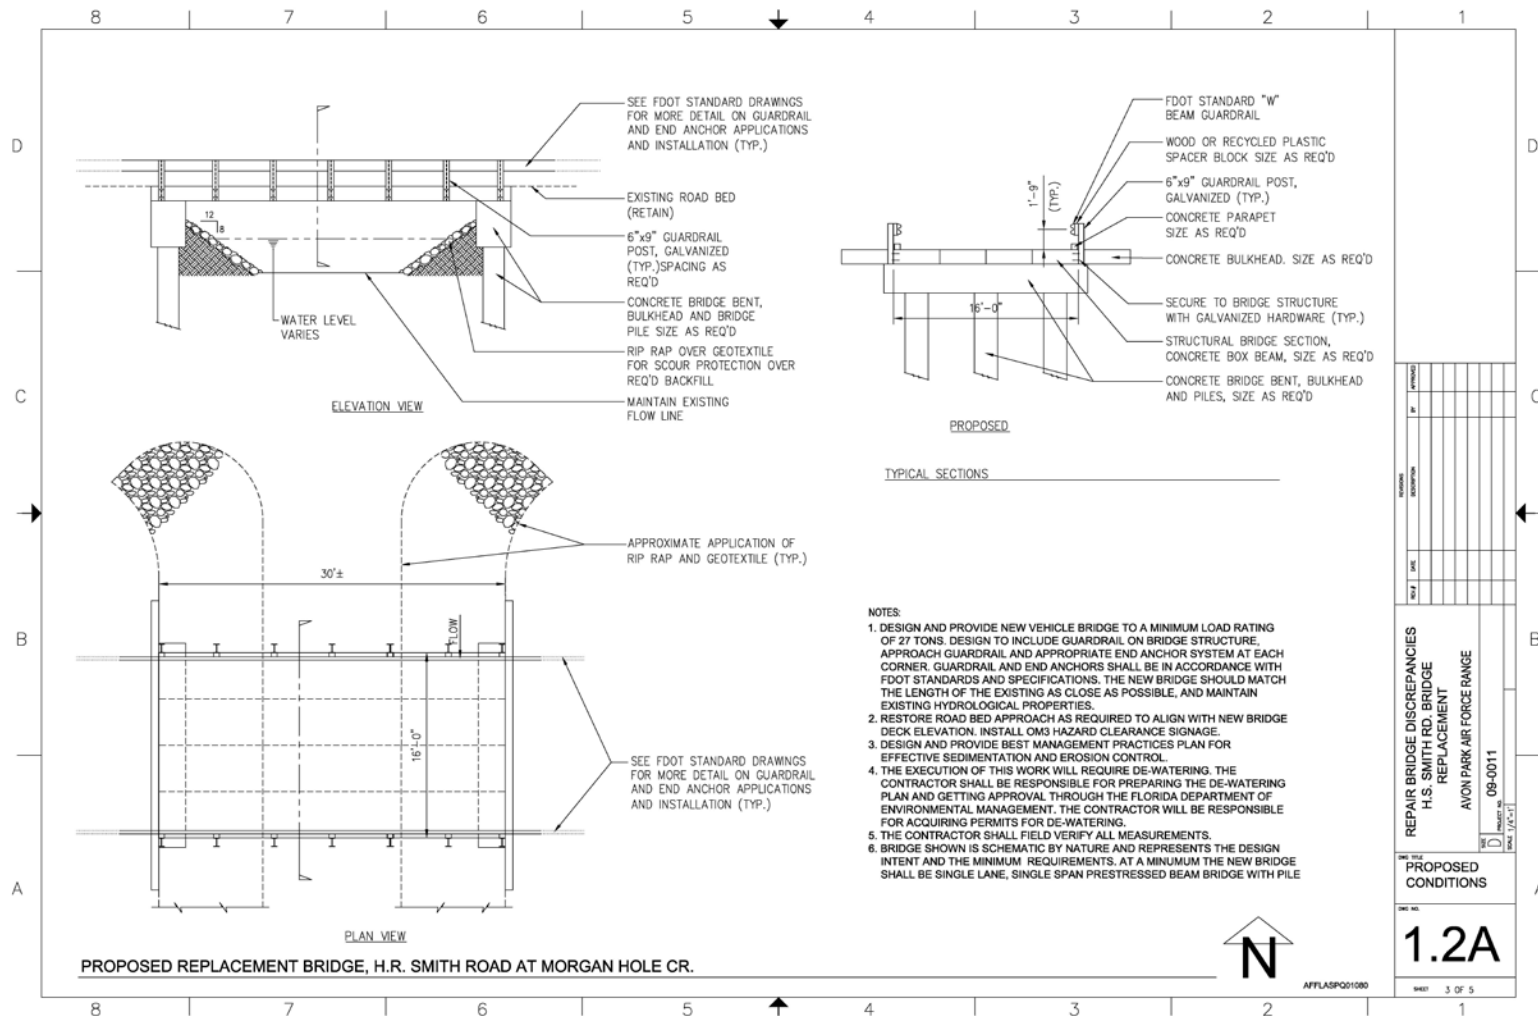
A schematic of the proposed new H.R. Smith Bridge with scour protection measures at Avon Park Air Force Range, Florida.
